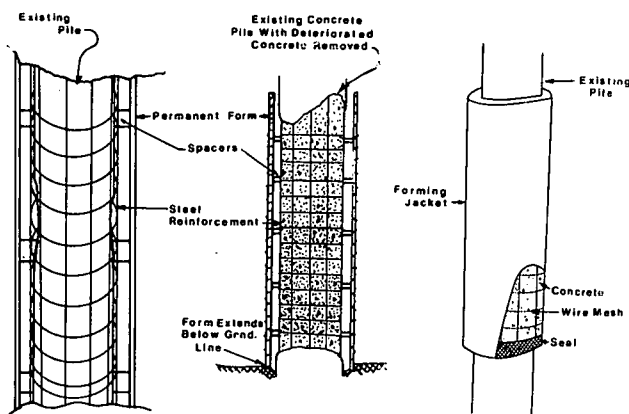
Permanent pile jacket forms for concrete piles (after 19).
